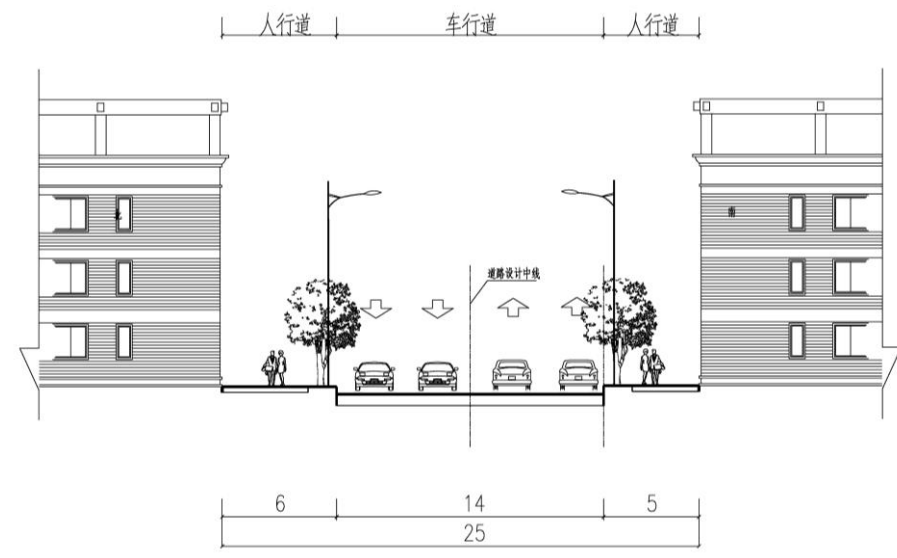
Sectional View of Existing Biyun Road (Wenchang Road ~ Hankou-Danjiangkou Railway)
